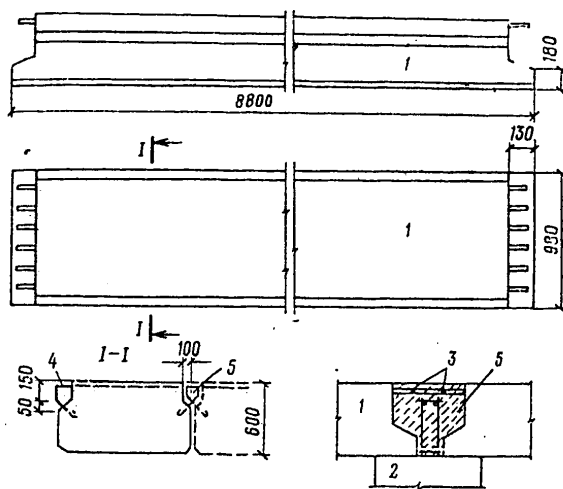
Continuous prefabricated slab with a 9-meter span. 1 -- slab; 2 -- support; 3 -- welded joint of the working reinforcing; 4 -- loops of the projections into the monolithing seam; 5 -- monolithing zone
